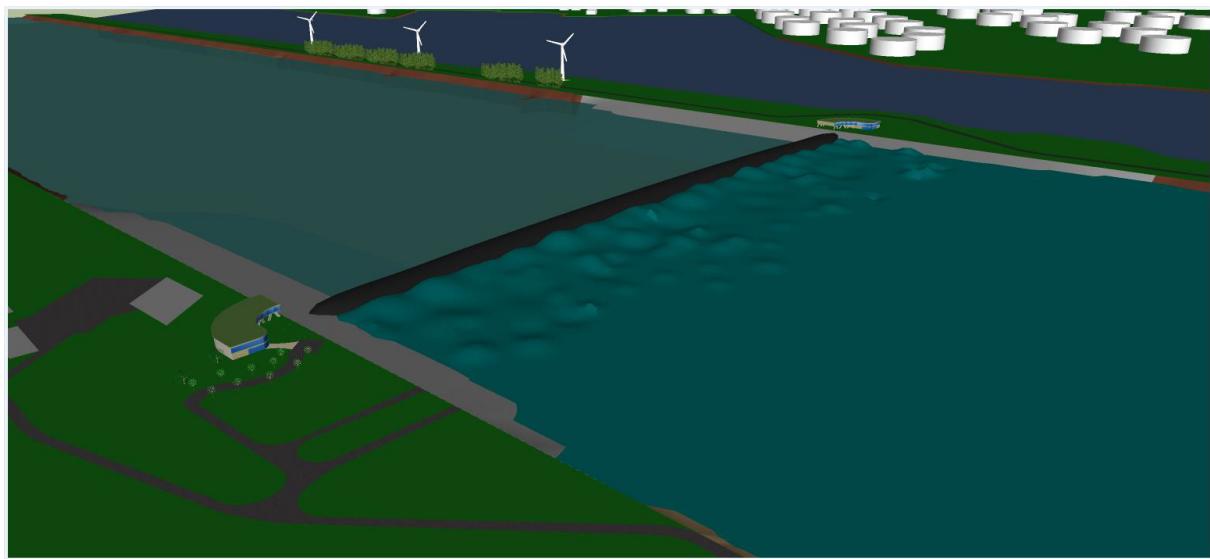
Possible design sketch of new inflatable rubber barrier [22]
